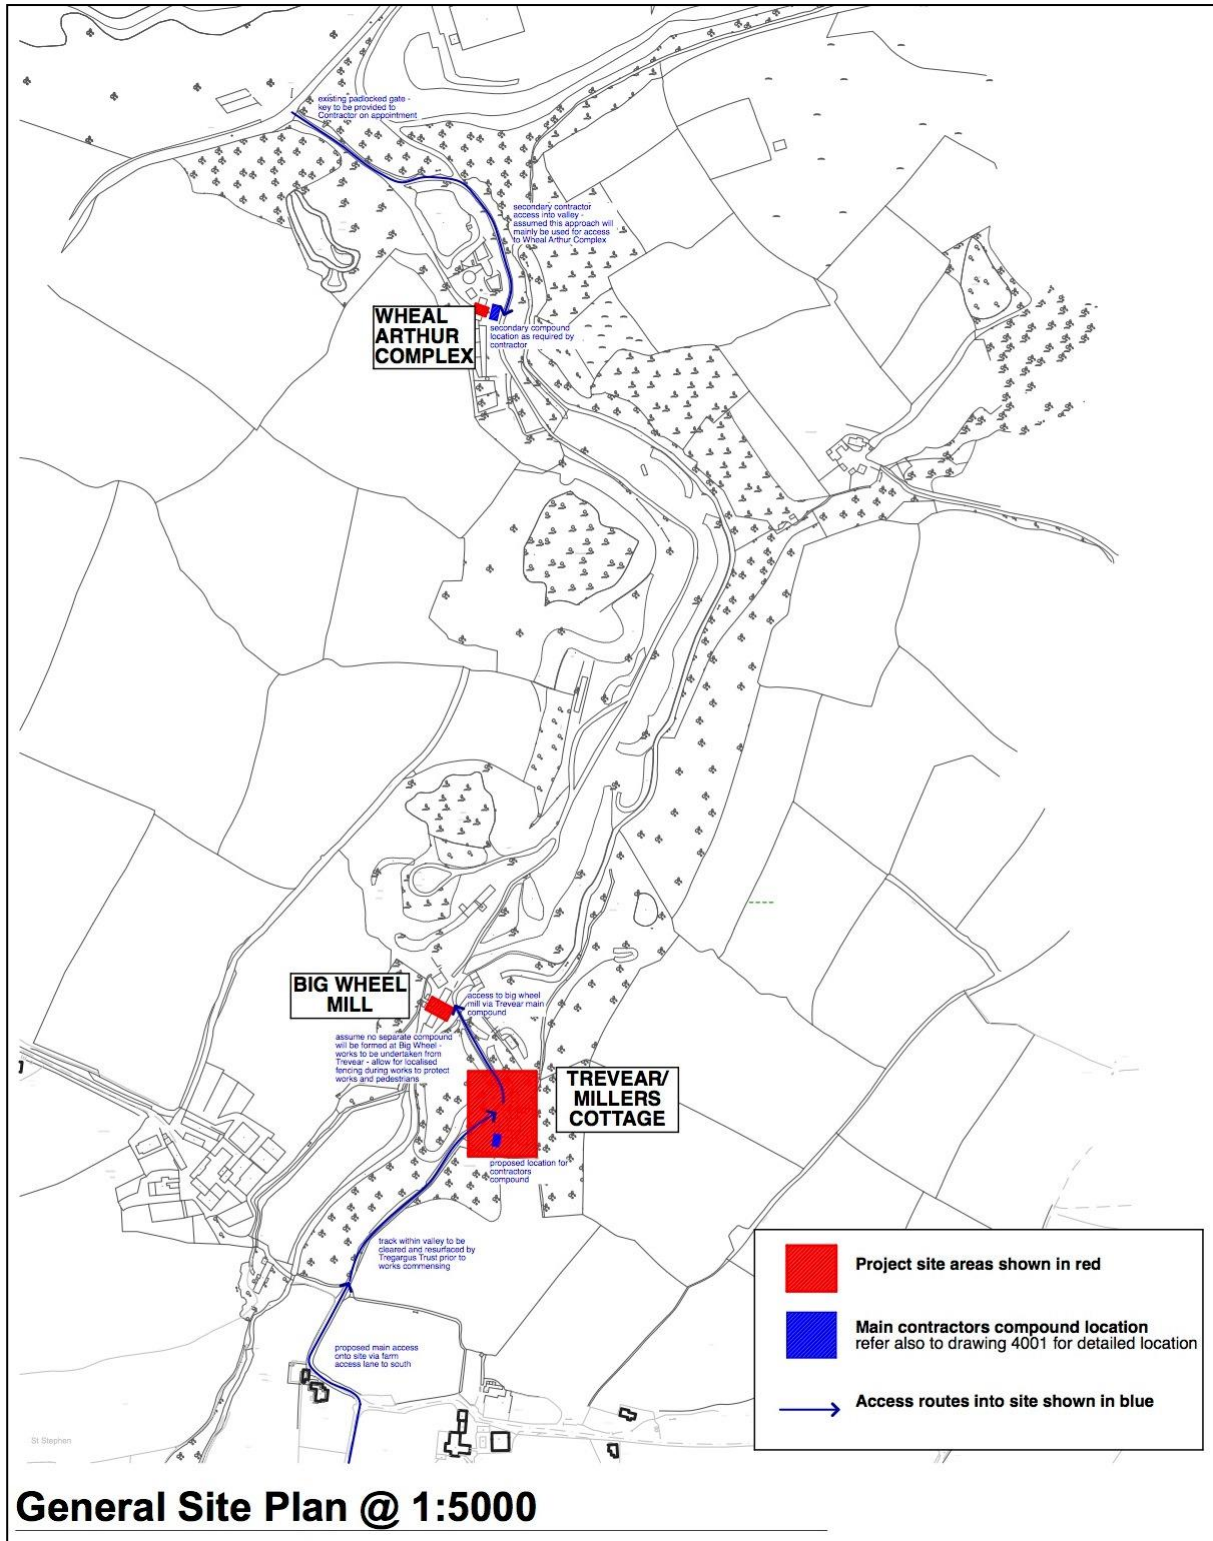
General site plan showing main project locations (excerpt from pdp Green Dwg. No. J13047-4100).
